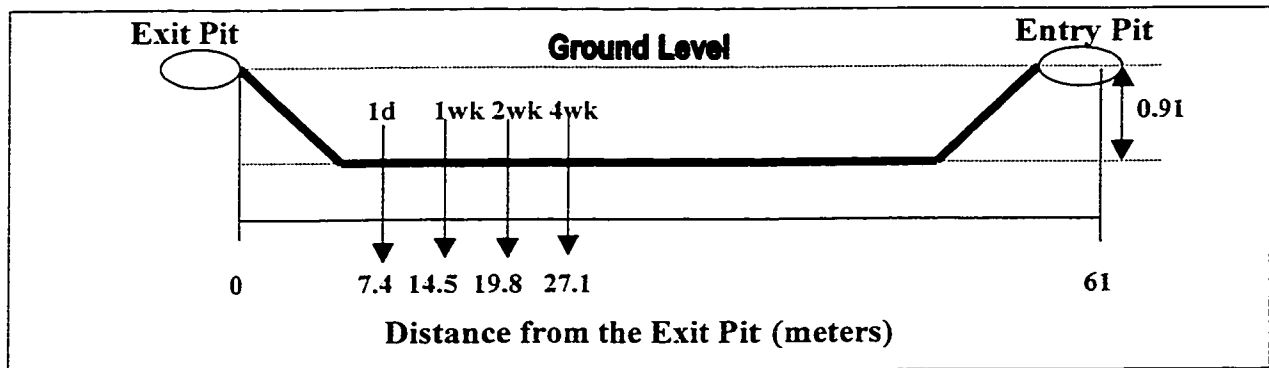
Elevation View of the 200mm Pipe Installation in Sand
